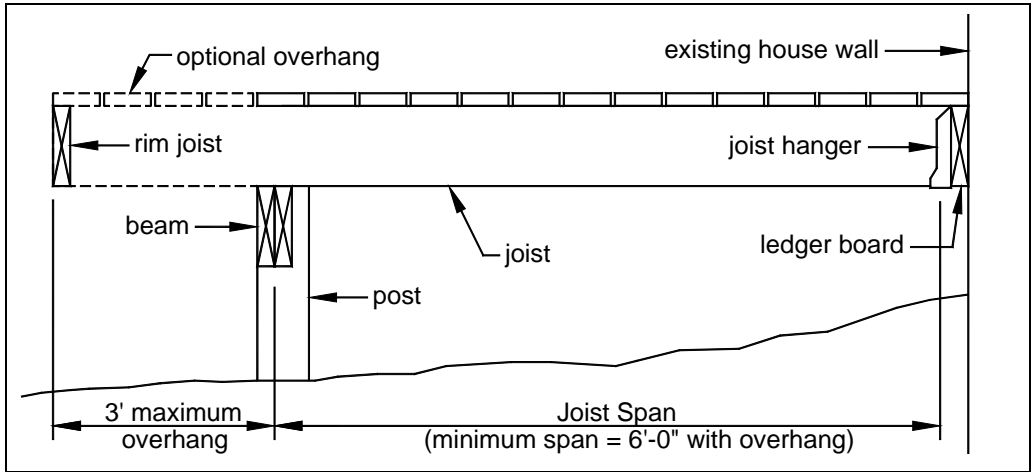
JOIST SPAN - DECK ATTACHED AT HOUSE
